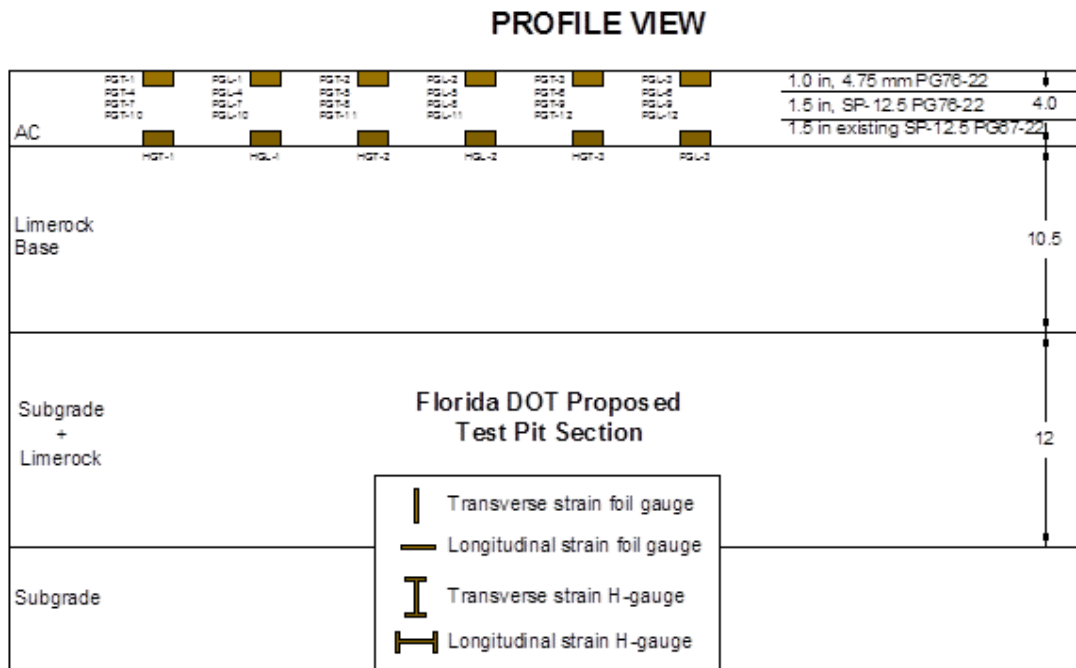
Illustration. Profile view of pavement structure and instrumentation for the test track section.
